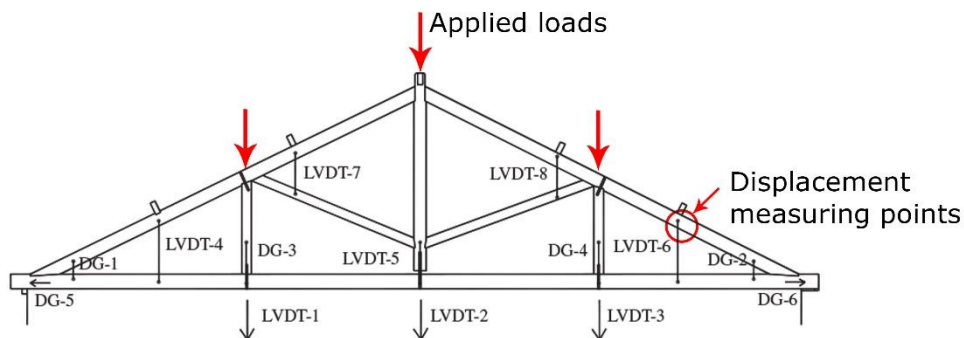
Testing layout of the Adico warehouse roof truss – first series of tests (after [137])
